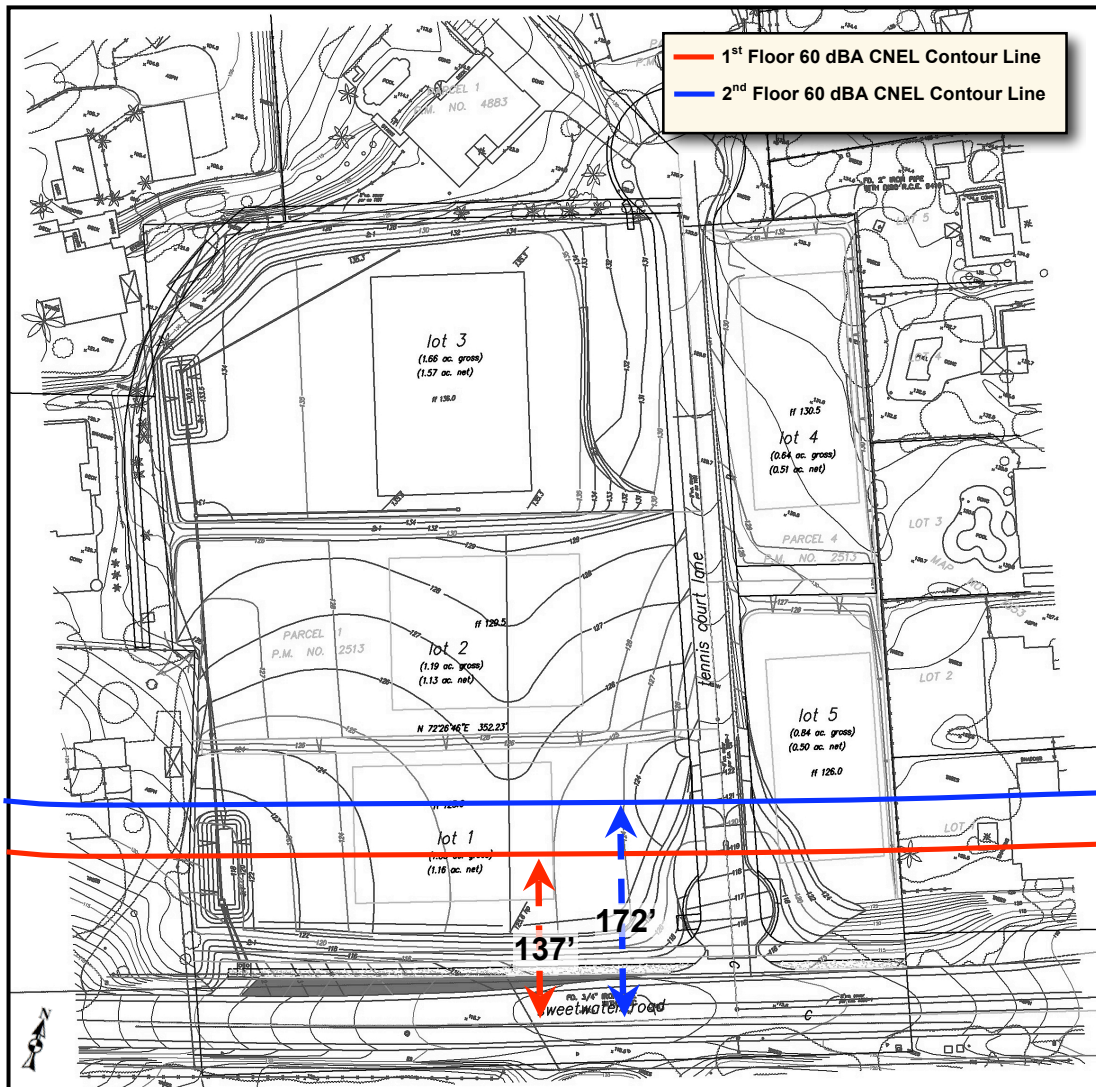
Unobstructed 60 Contours for Ground Floor from Sweetwater Road (ISE 9/07)
